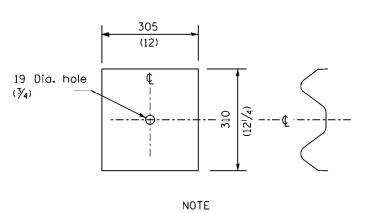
Plate A shall be placed between rail element and block-out at nonsplice mounting points only when steel block-outs are used.
